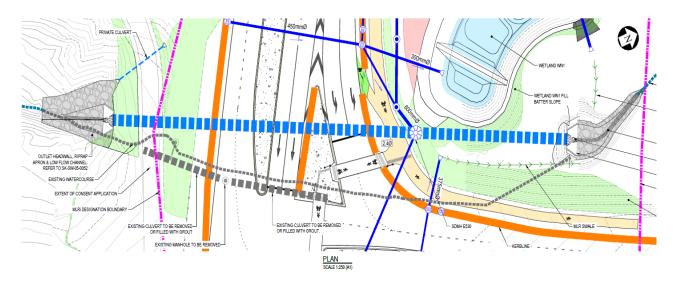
E530 Culvert arrangement (culvert is shown as blue dashed line).
